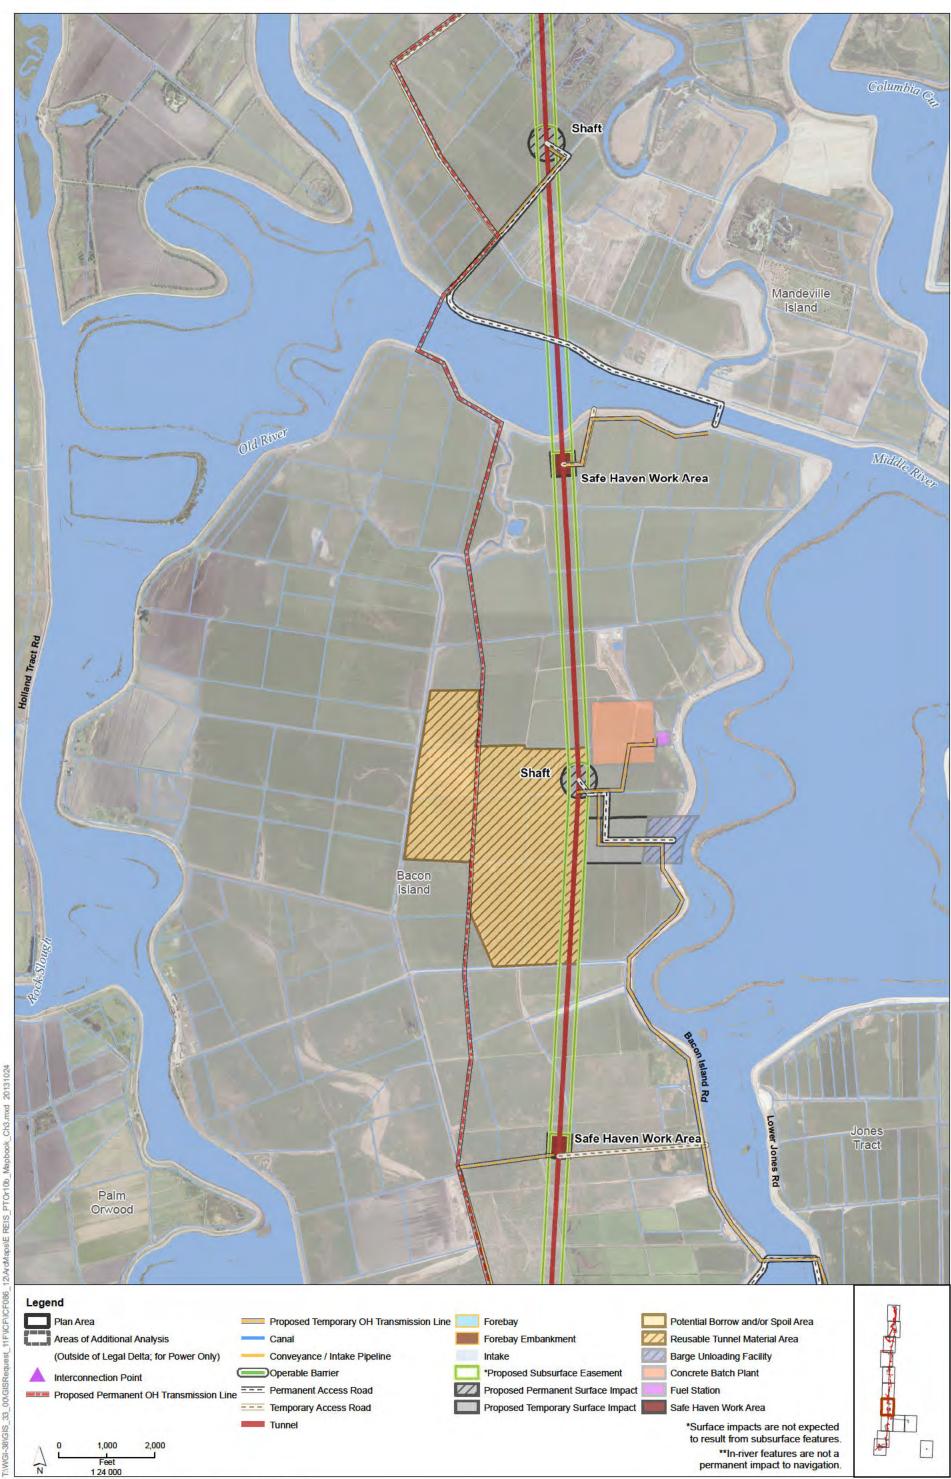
Sheet 7 of 13 Pipeline/Tunnel Alignment (Alternatives 1A, 2A, 3, 5, 6A, 7, and 8)
